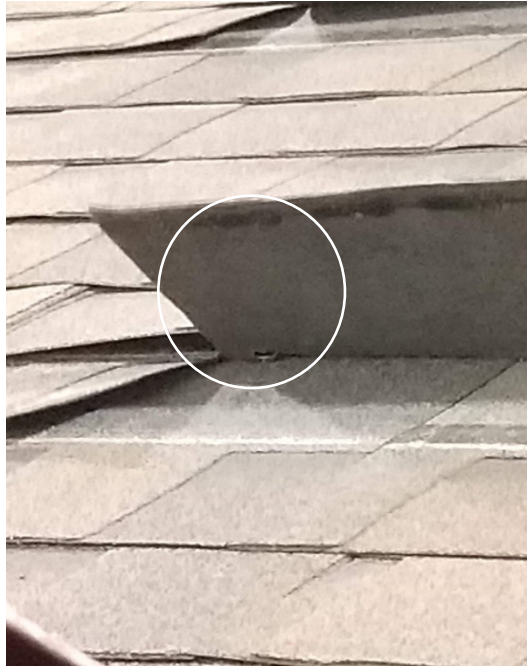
End of test observed failure modes (Failure Mode 1) - shingle pulled through the fastener
